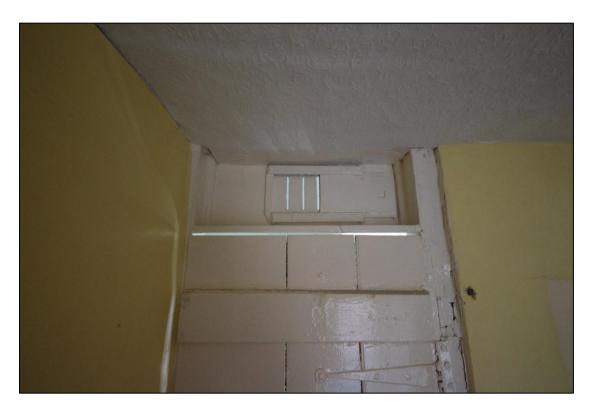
The ventilation shuttering on the narrow doorway, taking facing east.
